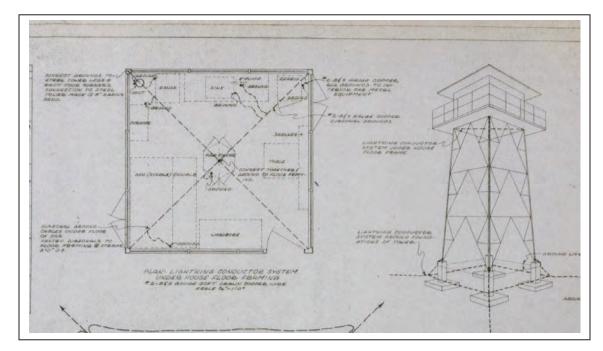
Detail from plan drawings for 1951 Standard Steel Lookout Tower Plan shows arrangement of living quarters for proposed new steel fire lookout towers at Isle Royale National Park. Scan courtesy of Isle Royale National Park from Isle Royale National Park archives held at Keweenaw National Historical Park, Calumet, MI
